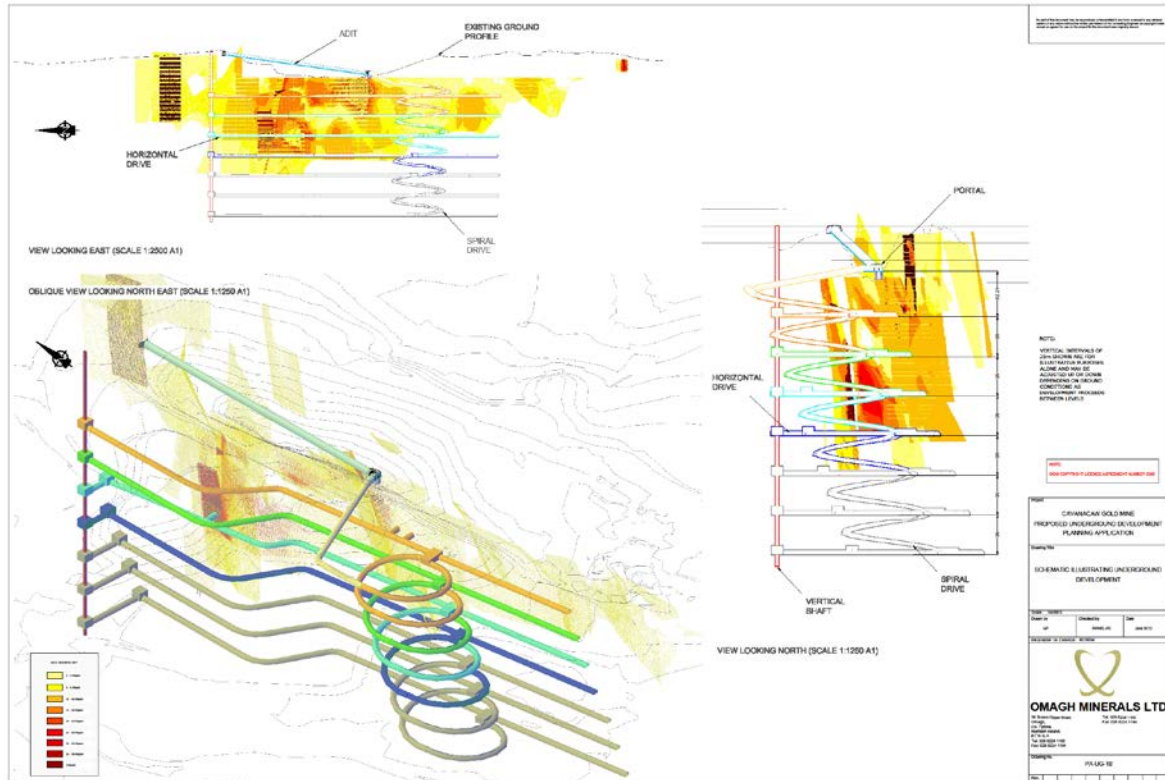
PLANNED UNDERGROUND DEVELOPMENT
